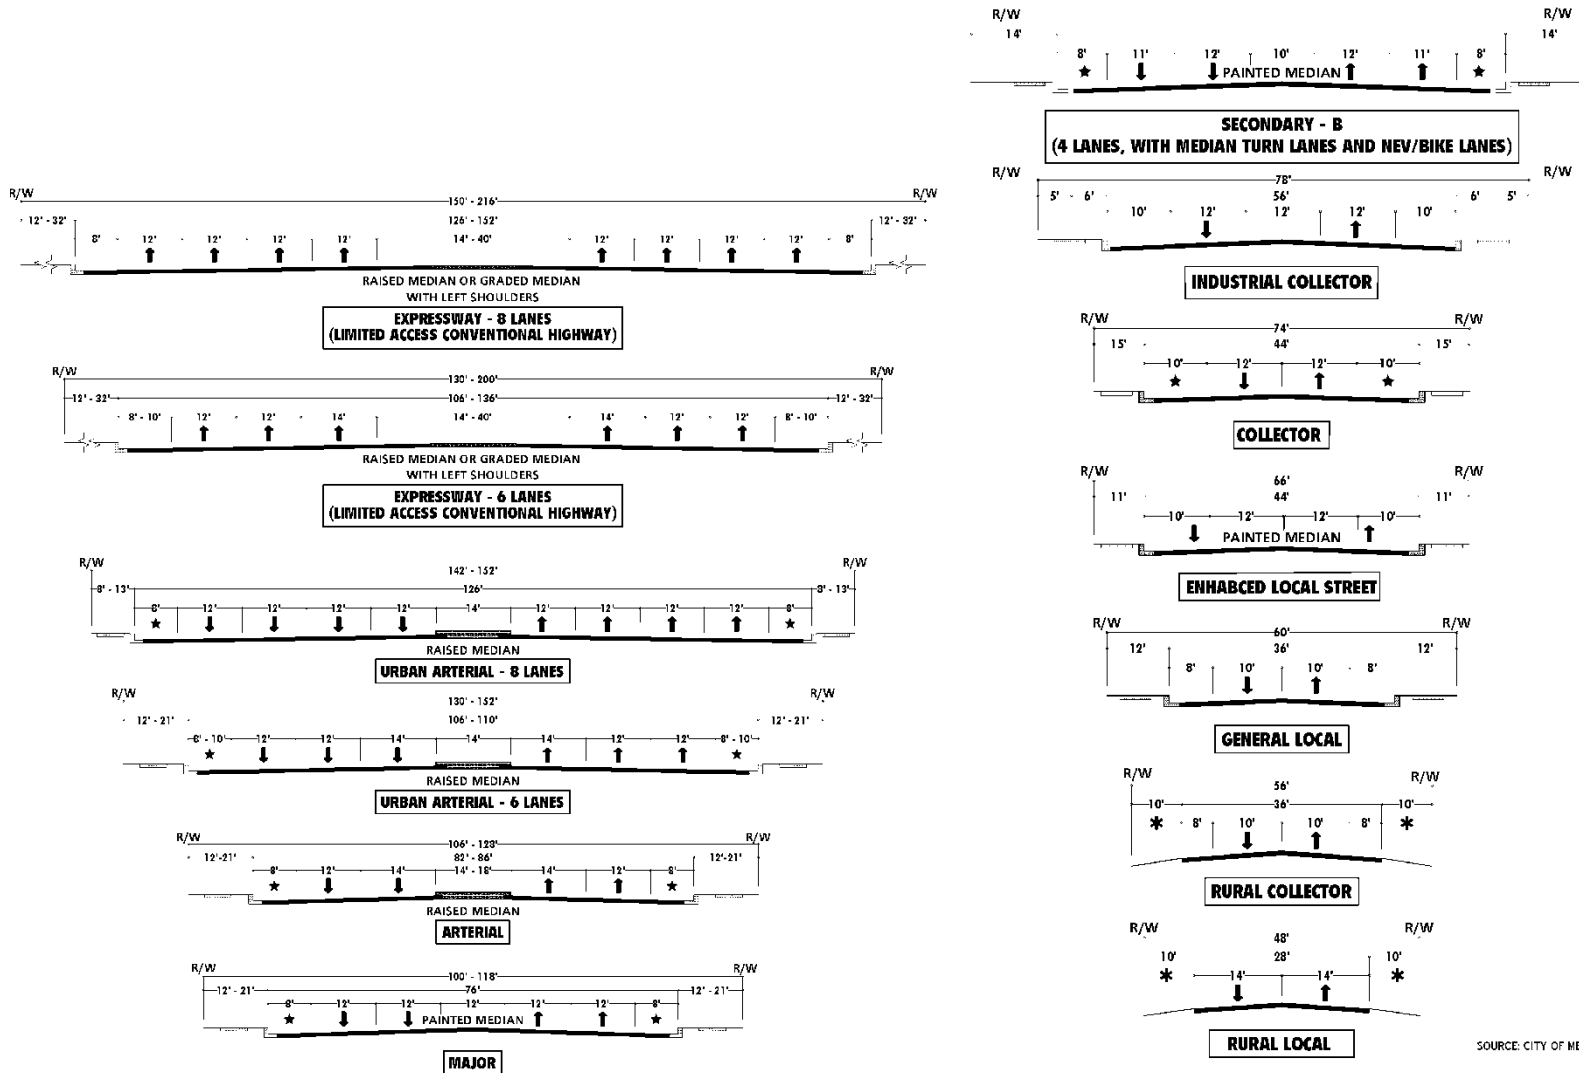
CITY OF MENIFEE GENERAL PLAN ROADWAY CROSS-SECTIONS
